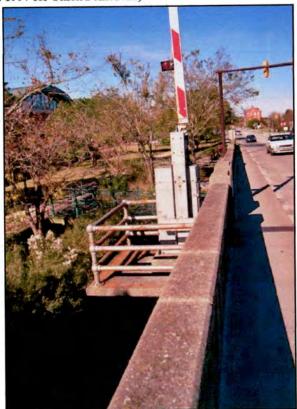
Traffic Barrier Platform, west side of bridge, looking north (convention center and Sparrow House in distance)
